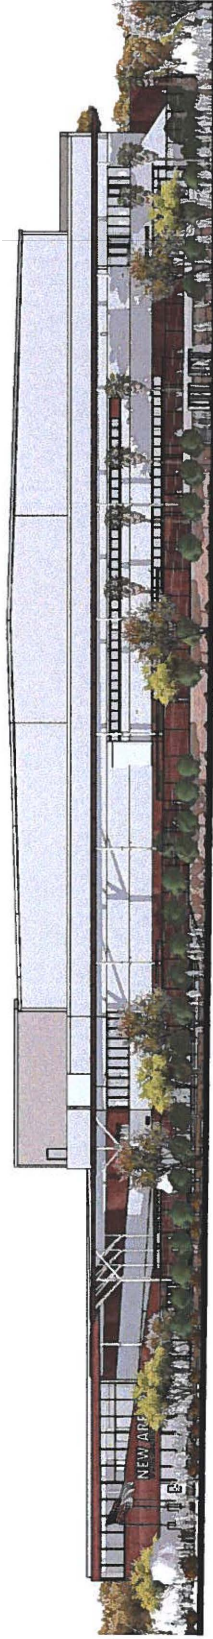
EXTERIOR ELEVATIONS
